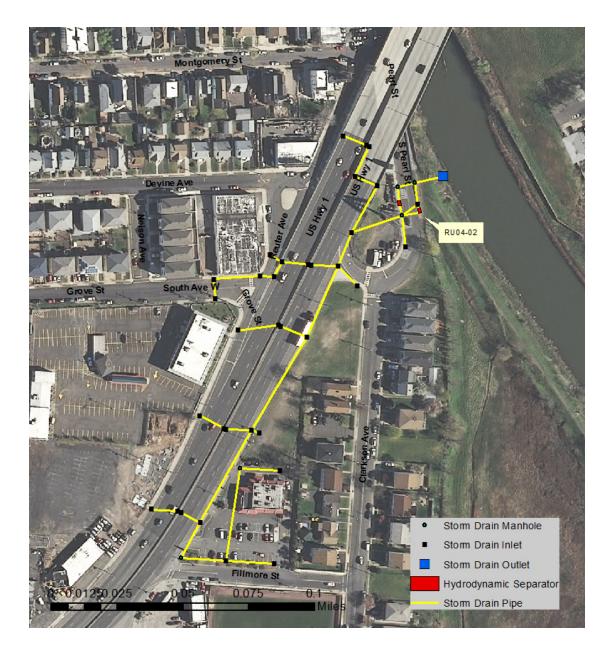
Storm drainage network (RU04-02, Elizabeth, NJ)
